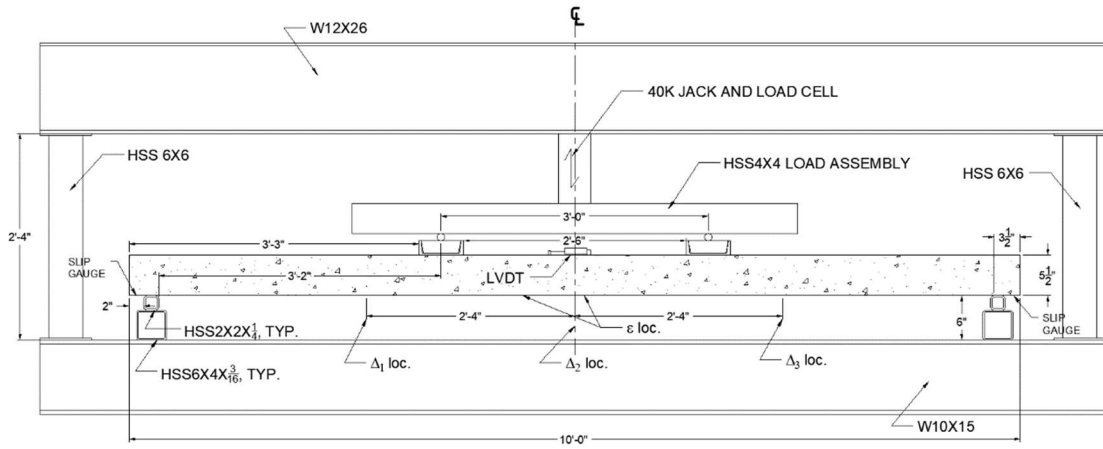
Load frame apparatus with specimen loaded diagram.
